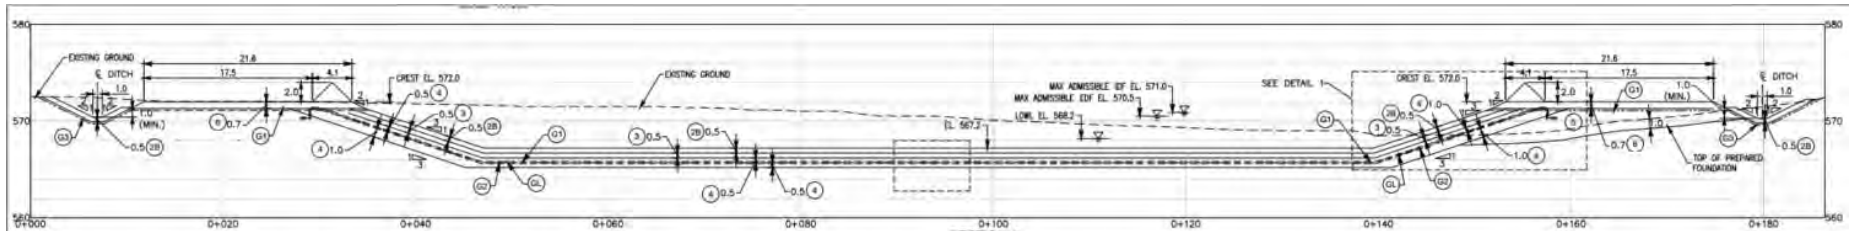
Rose North Overburden Stockpile Collection Pond Typical Section
